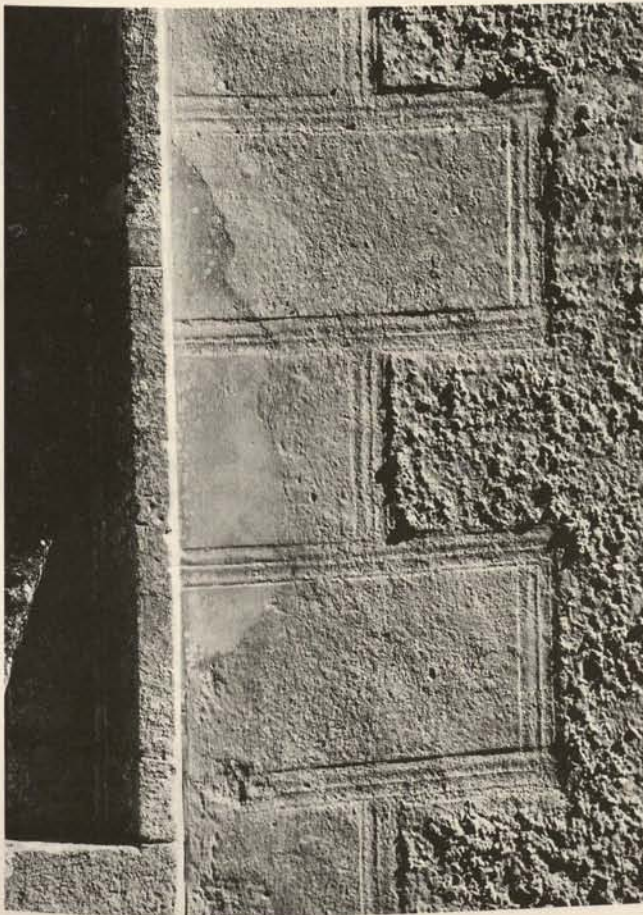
Second case study: Woolgatherers staircase. The original lime surface before repair work. Note previous repairs with Portland cement on wall to right, and on timber lintel below.
